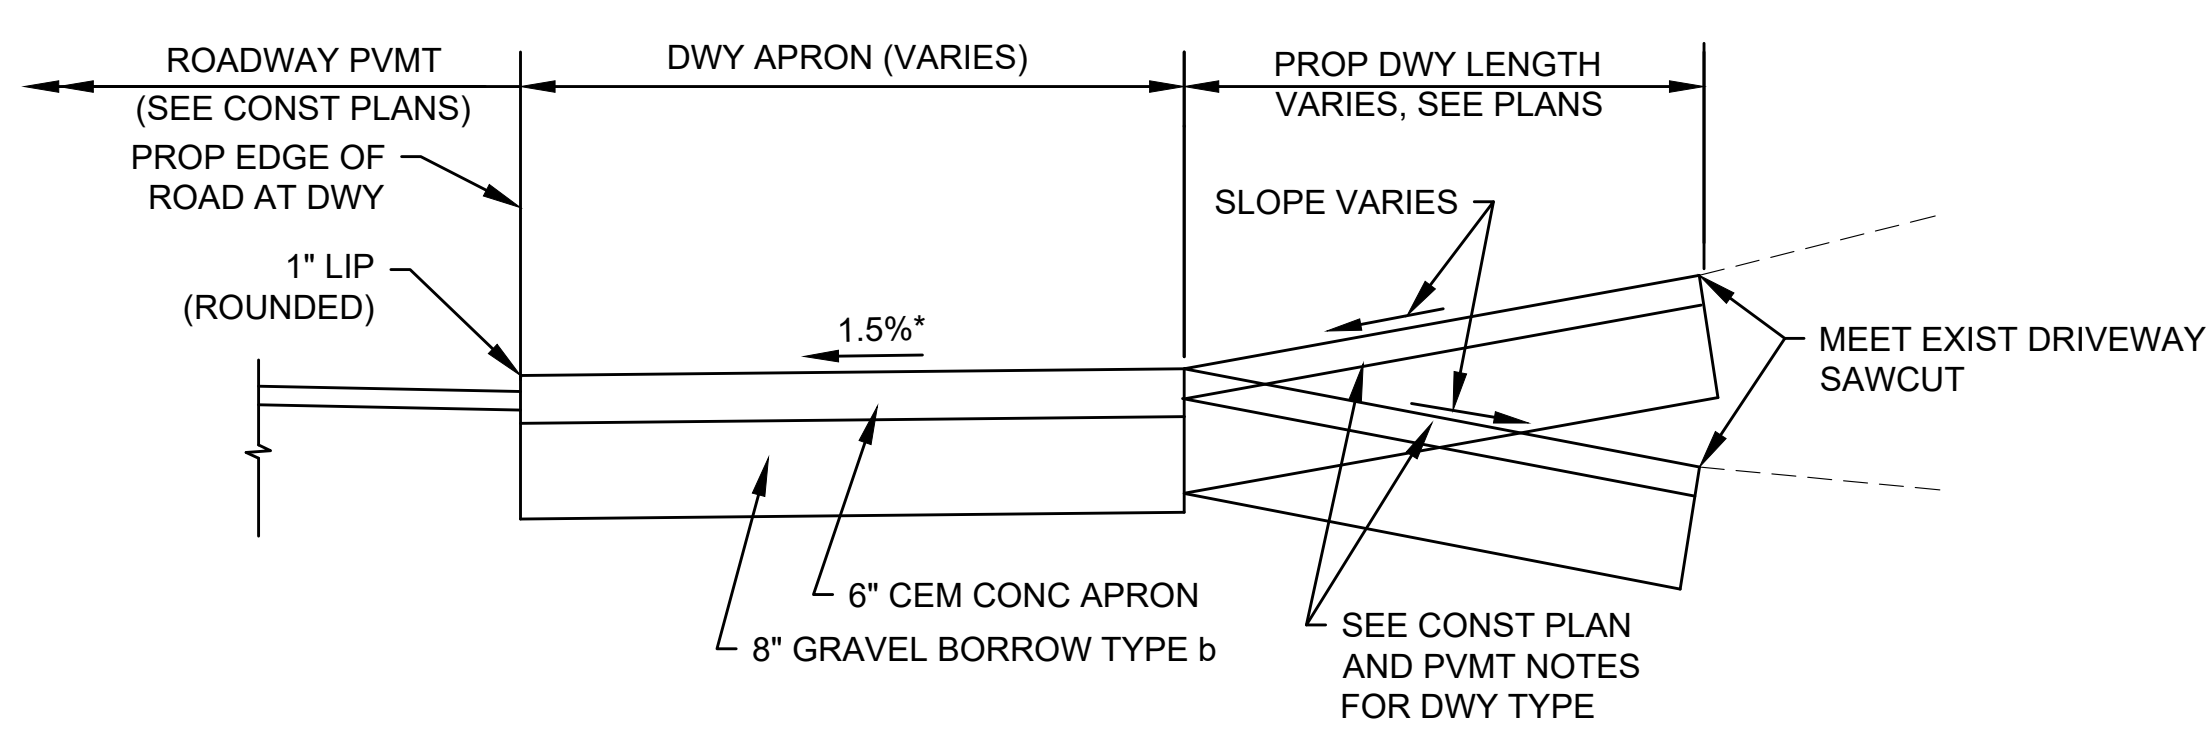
DETAIL FOR TYPICAL DRIVEWAY WITH SIDEWALK - TYPE A
